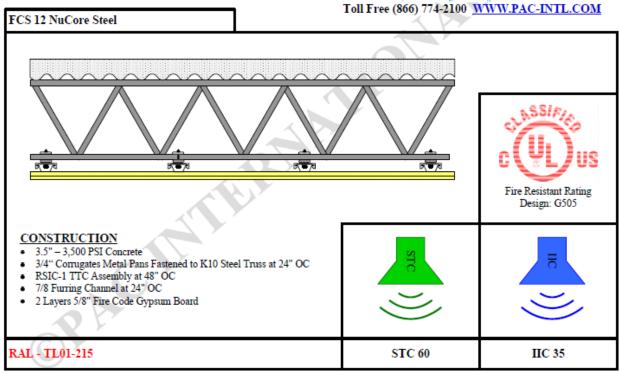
Concrete Slab on Deck and Bar Joist Assembly IIC Rating
